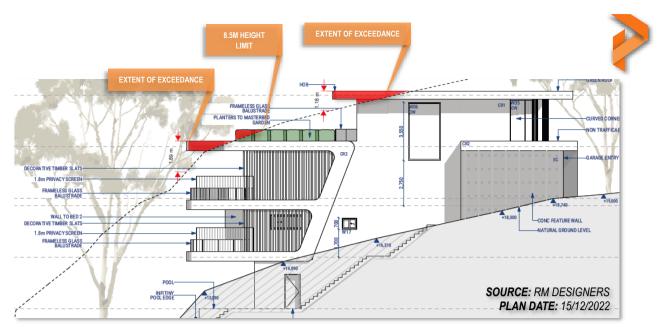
EXTRACT AND MARK-UP FROM SOUTH ELEVATION INDICATING HEIGHT LIMIT BREACH
